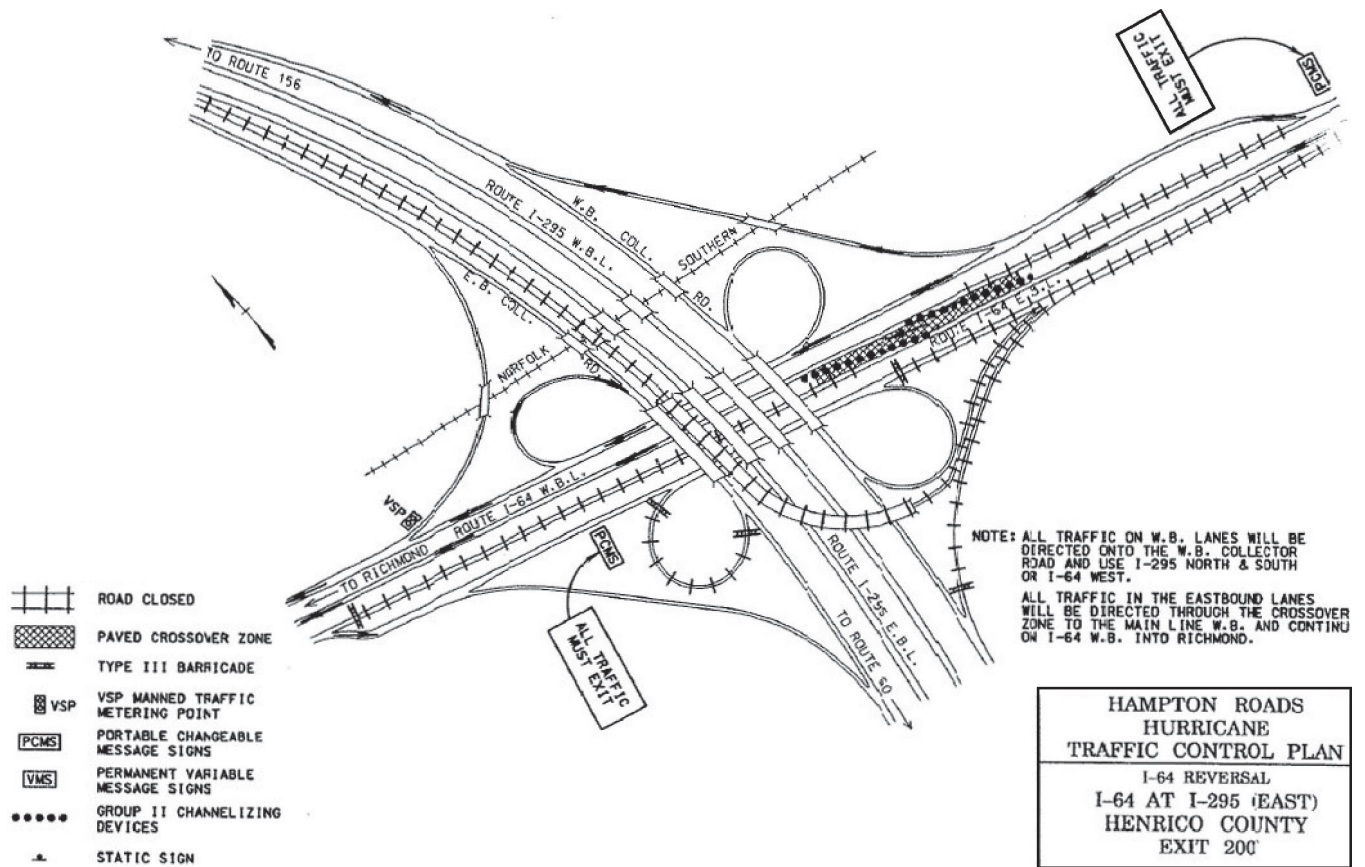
I-64 contraflow termination plan (SOURCE: Virginia DOT).
